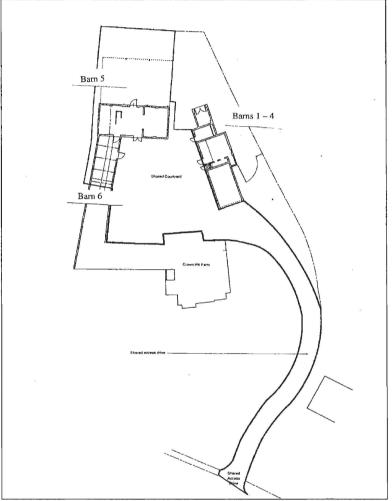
Layout of farm buildings at Crown Hills Farm (from drawing supplied by developer; not to scale)
